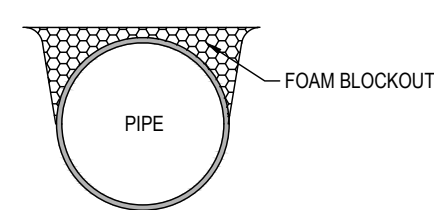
G: EXCAVATE AROUND MAIN & ATTACH BLOCKOUT
